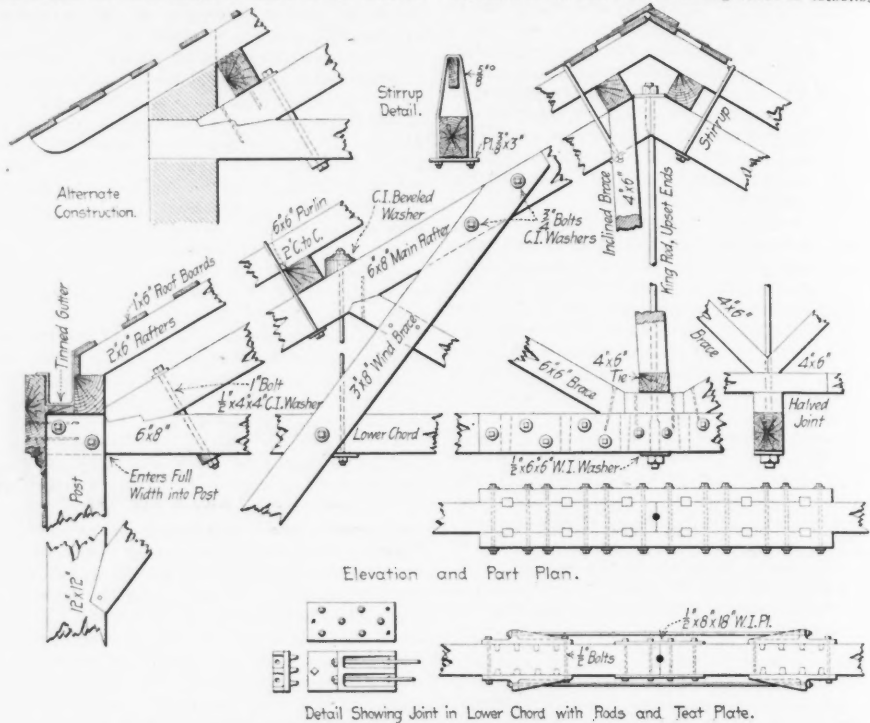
DESIGN FOR TIMBER ROOF TRUSS, BY J. D. GALLOWAY.
